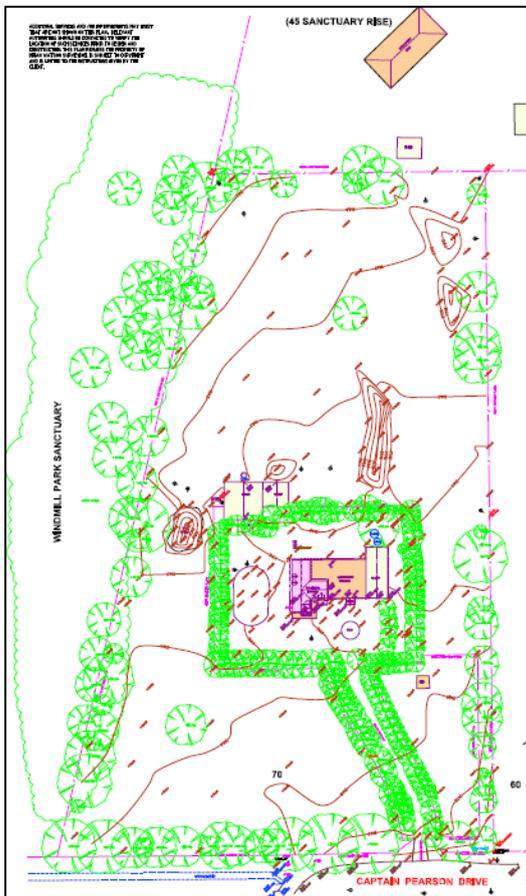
Excerpt of Feature and Level Survey Plan (Source: Brian Watson Surveying)
